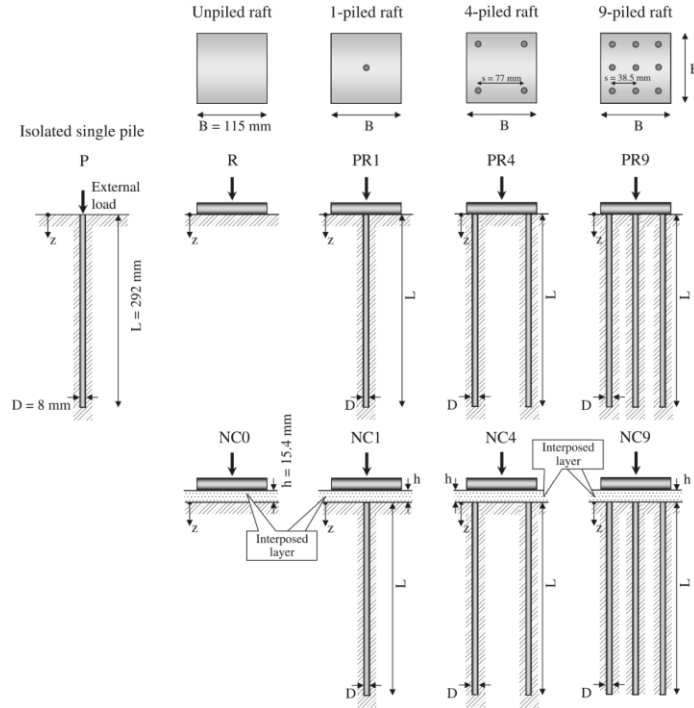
Schematic view of model foundations in the serious #2 of centrifuge tests, adapted from Fioravante and Giretti (2010)
